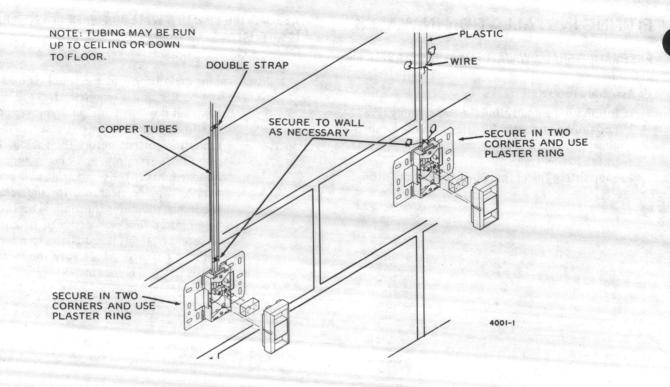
Mounting Shallow Wall Box and Plaster Ring on Wall to be Plastered.
